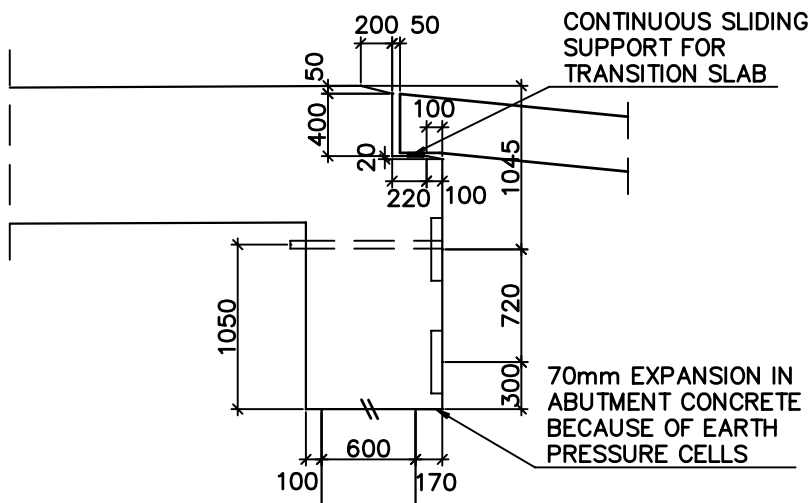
Tekemäjärvenoja Railway Bridge eastern abutment cross section (Laaksonen 2005).
